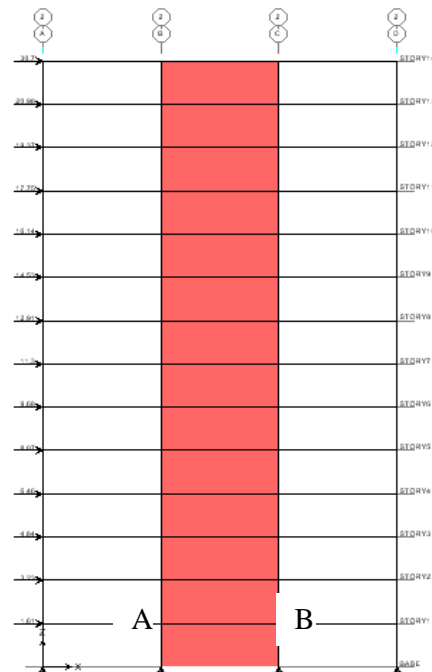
Flat plate structure similar to moment resisting frame with shear wall under horizontal loading
